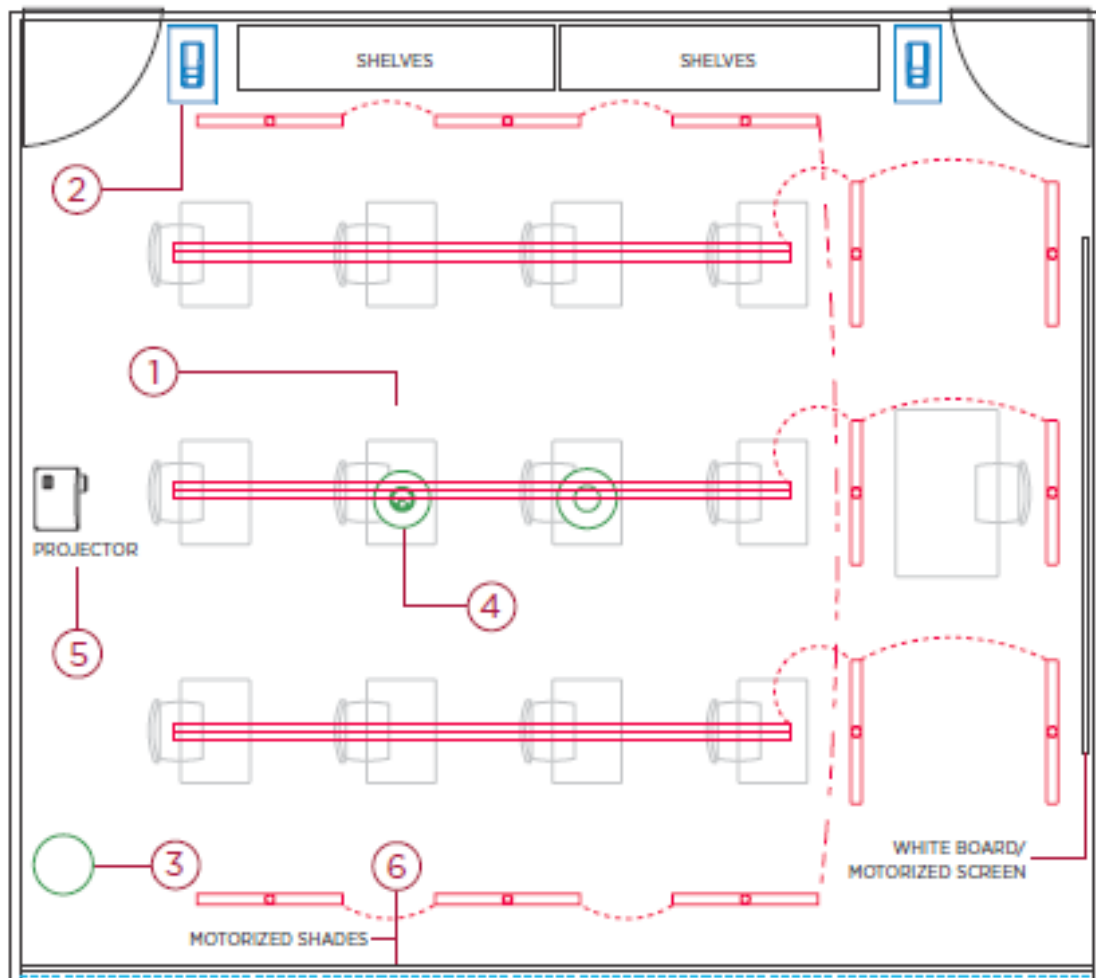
Classroom artificial lighting floor plan arrangement C (Vantage, 2013)
